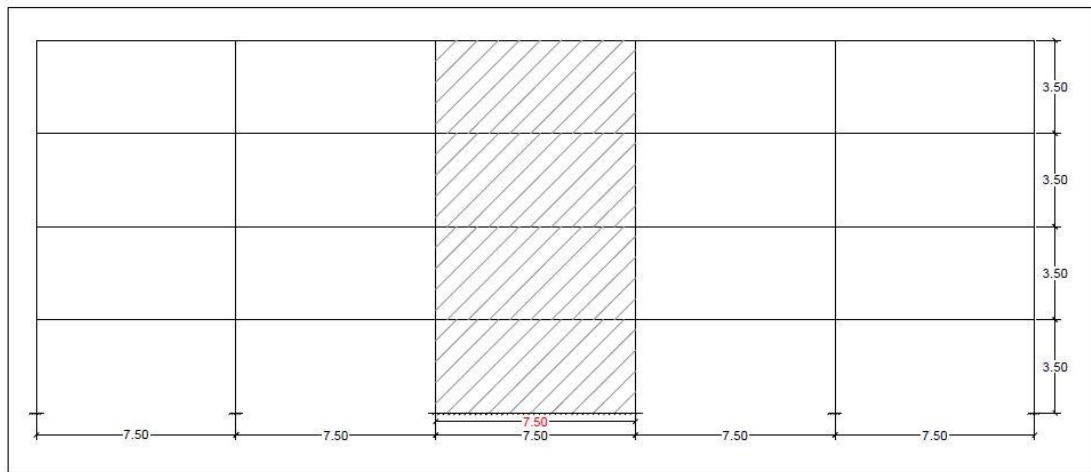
Elevation of 4-story building with steel plate shear walls having aspect ratio of 2.142 (Model 5)
